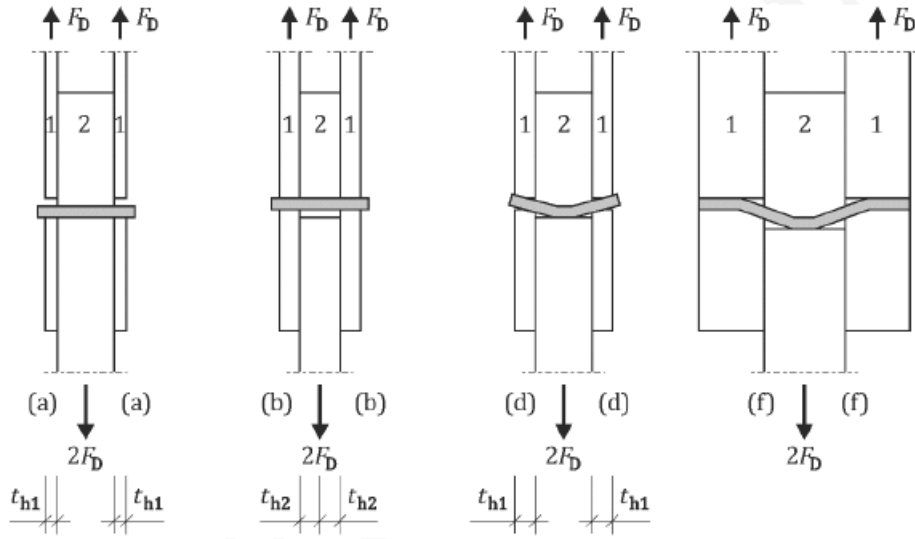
Failure modes (a), (b), (d) and (f) of a single shear plane for a fastener loaded in double shear planes [1].
